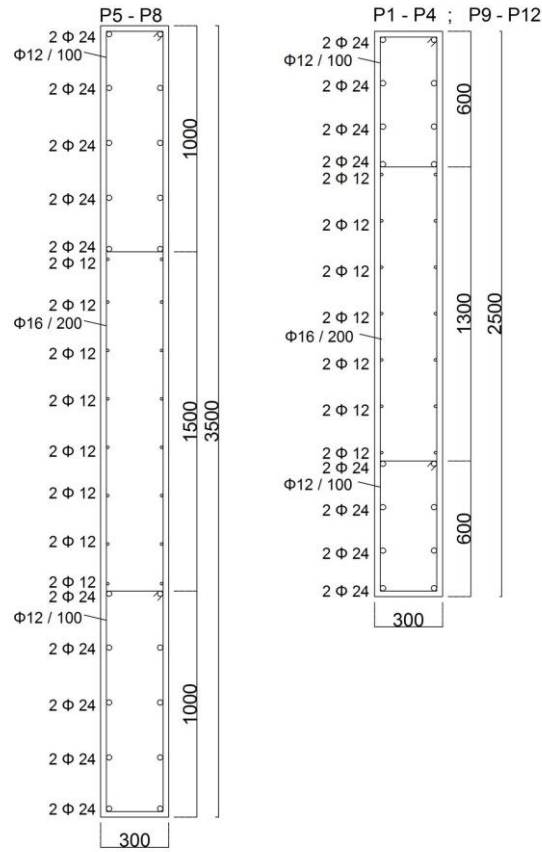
Sections and reinforcement details of shear walls through the critical shear wall height (H_{cr})
